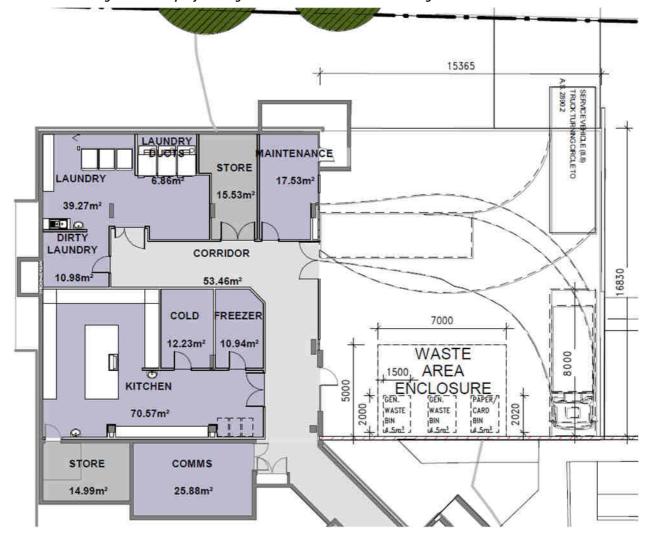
Excerpt of Building D Ground Floor Plan DA1001 showing Waste Area Enclosure.
